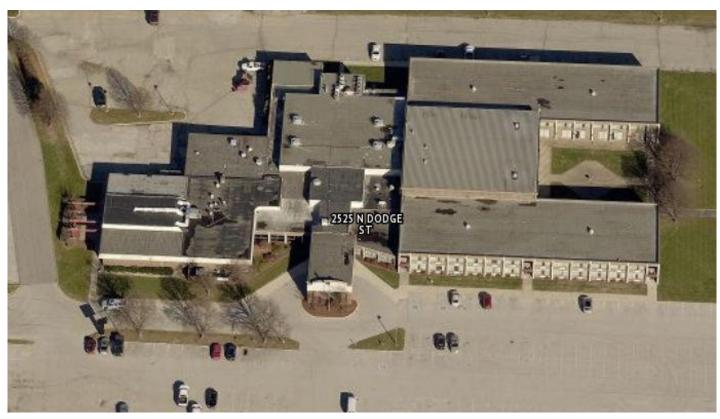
Rooftop view of the building looking north (Johnson County Assessor, 2020) (note that the west canopy beams are still in place, pergola-like)
